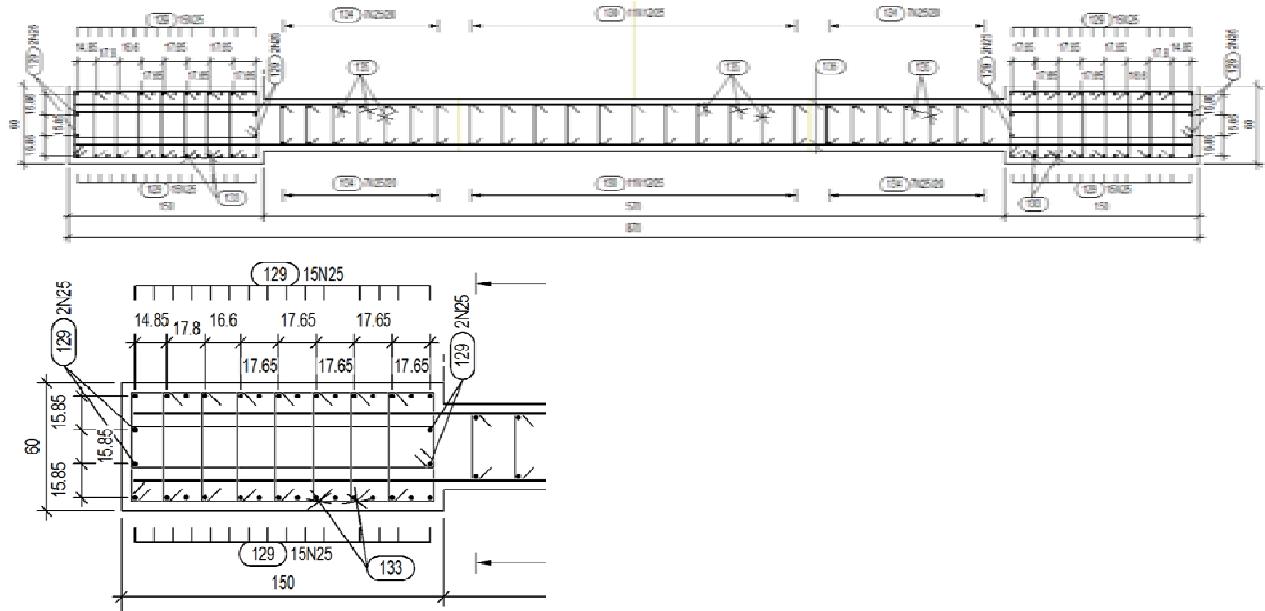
An example for detailing shear wall with dumbbell cross section designed and detailed according to Eurocode 8
